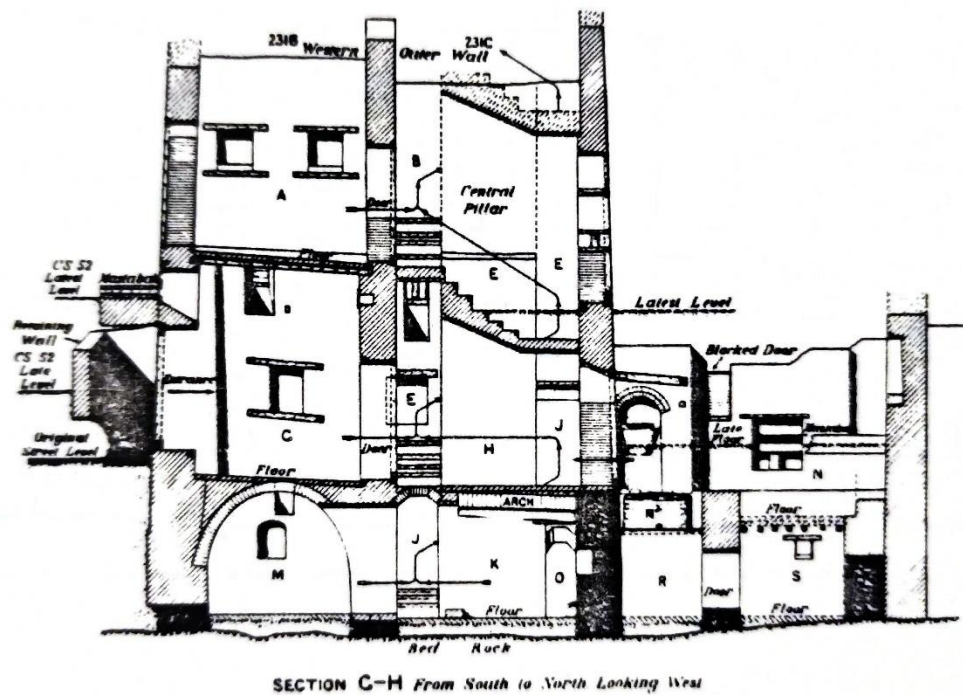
Elevation of Karanis House C56. The floor on the first floor is tilted in the same fashion as the windows (Husselman 1979, plan 39).
